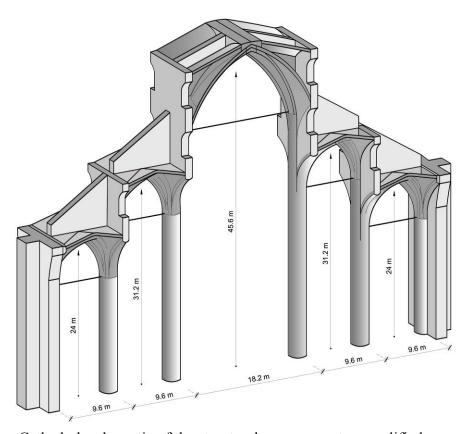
Milan Cathedral: schematic of the structural arrangement exemplified on one bay of the church
